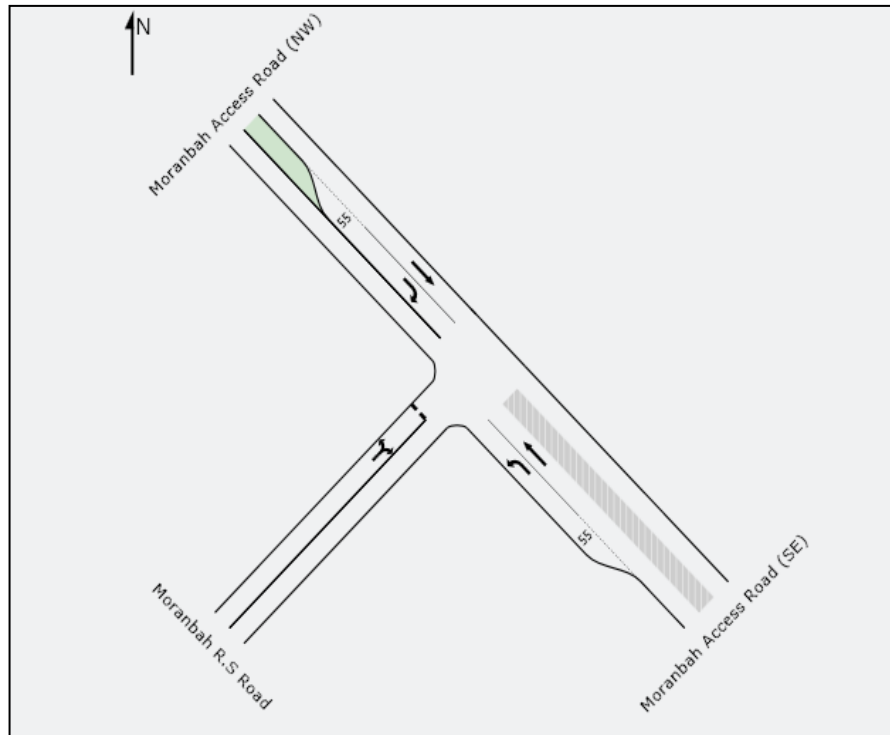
Proposed Intersection Layout – Moranbah Access Road / Moranbah Railway Station Road
